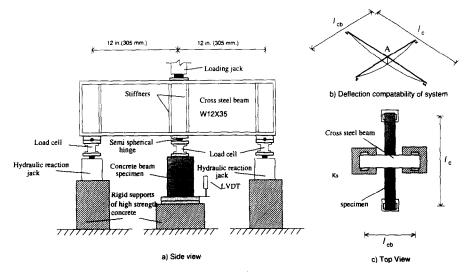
Testing set with the cross steel beam as stiffening elements.
